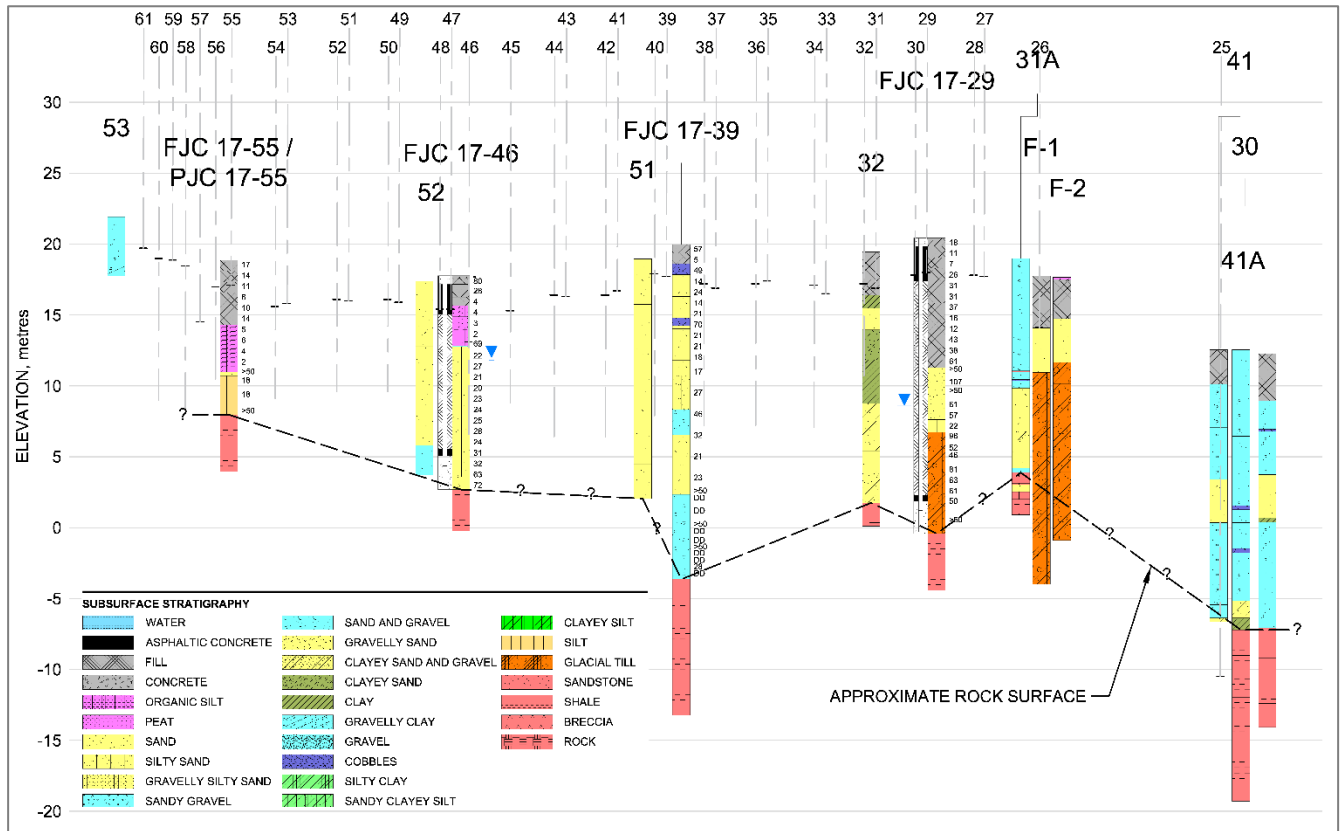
Cross-Section from piers 25 to 61 on Montreal island.
